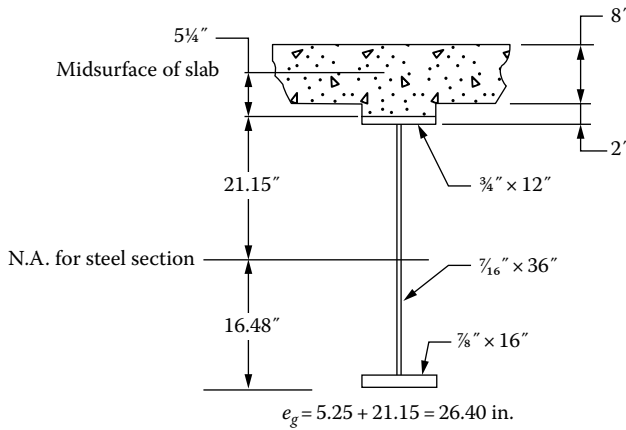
Determination of e_g for girder section of Example 4.9. (Adapted from American Iron and Steel Institute, *Four Design Examples of Steel Highway Bridges*, New York, 1997.)
